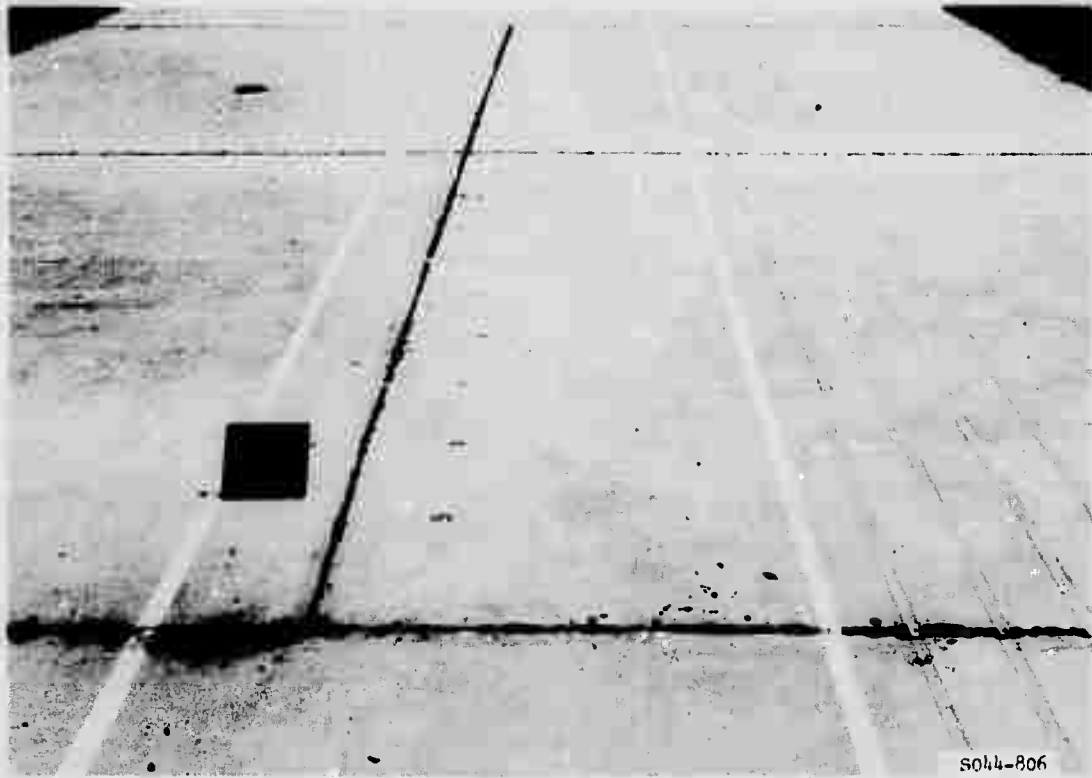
Item 4, lane 1, rigid pavement test section, prior to traffic
